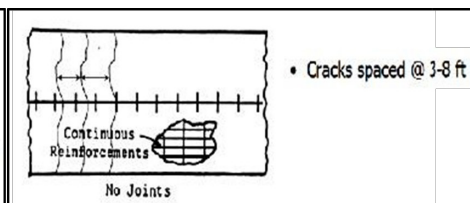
Continuous Reinforced Concrete Pavement
